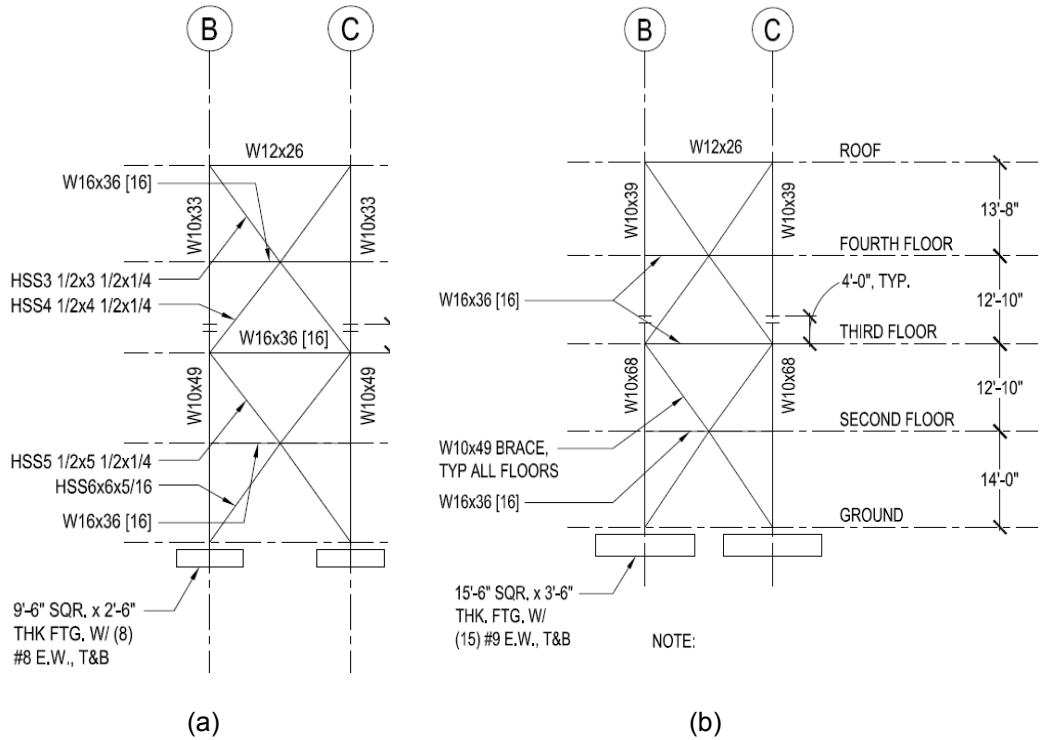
Office building braced frame elevations for: (a) wind design; and (b) current local seismic code design.
